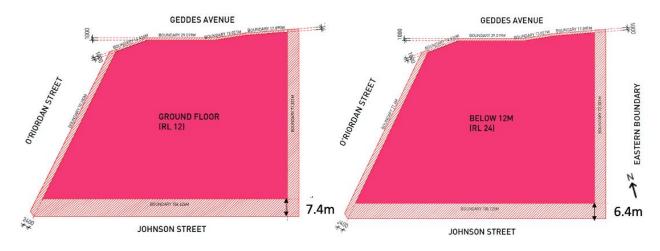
Ground floor and second floor concept building envelope drawings depicting Johnson Street 1m landscape setback and encroachment
